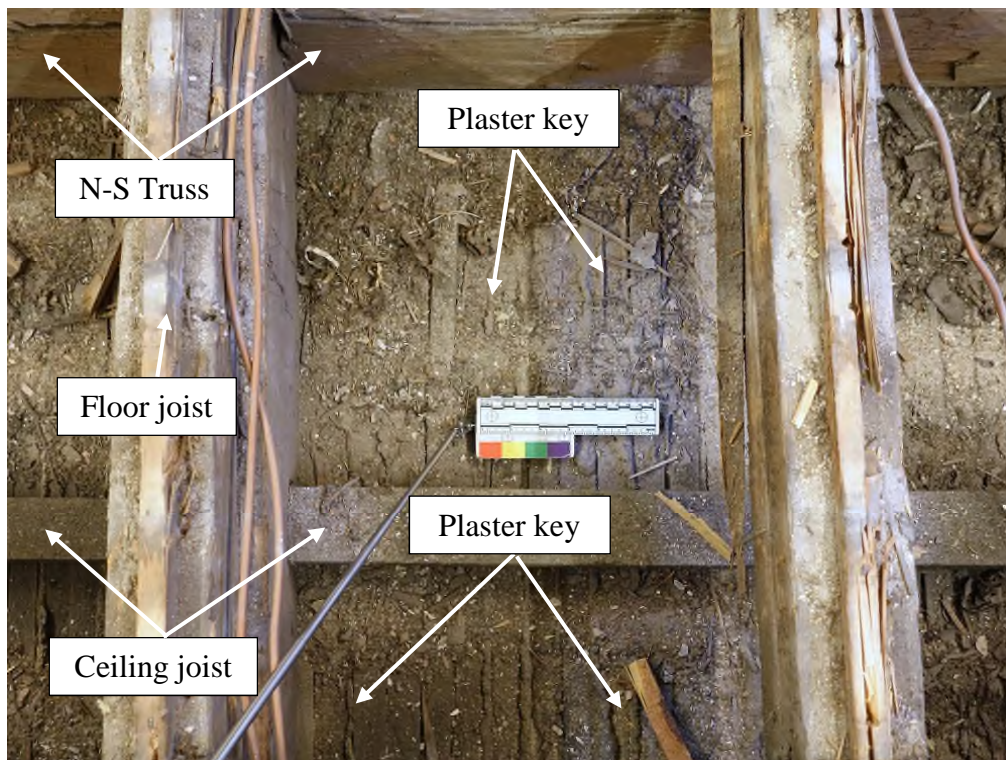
Ceiling back showing moderate plaster key in central area 'A'
